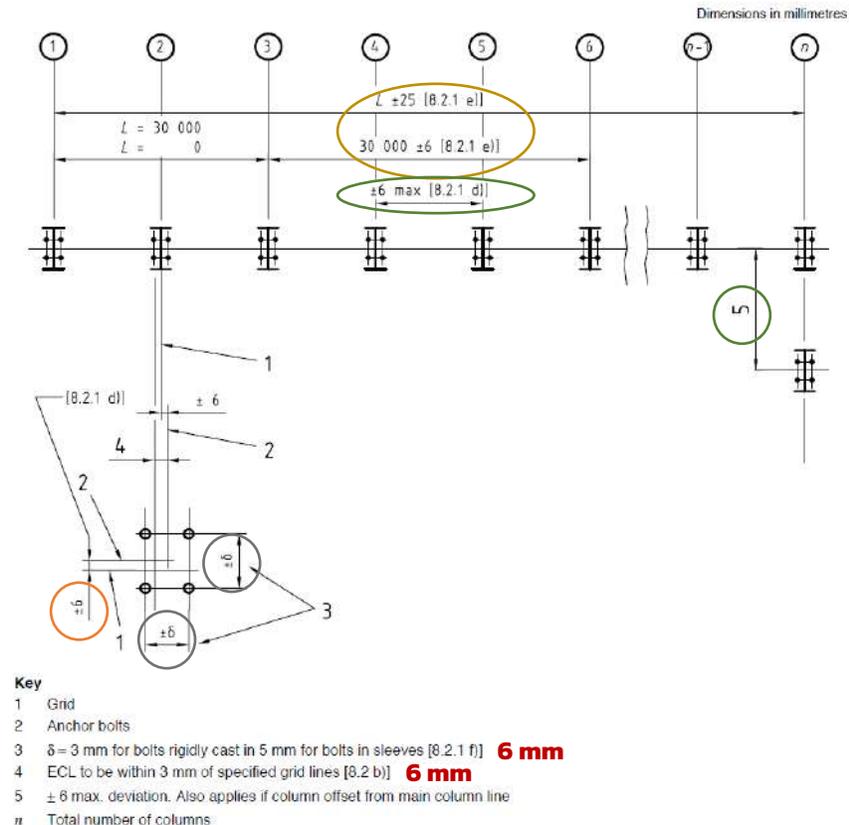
Tolerances on anchor bolt placement (see 8.2.1)
